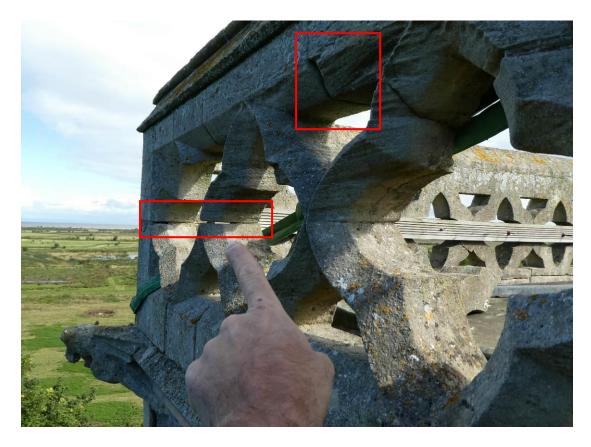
P10004263 Open Joints Illustrating West Elevation Parapet Bowing Out to West
